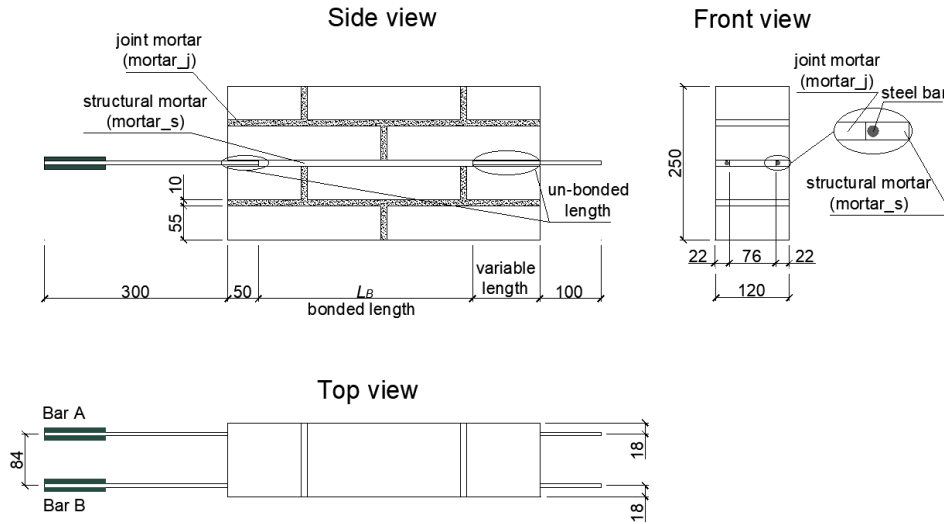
Sketch of a masonry wallette with two bars embedded for a length L_B in central bed joint.
